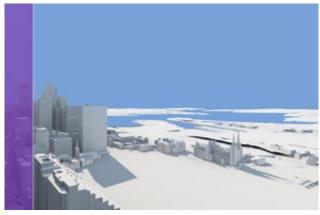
27 Park Street, high rise perspective of the proposed envelope (purple)
